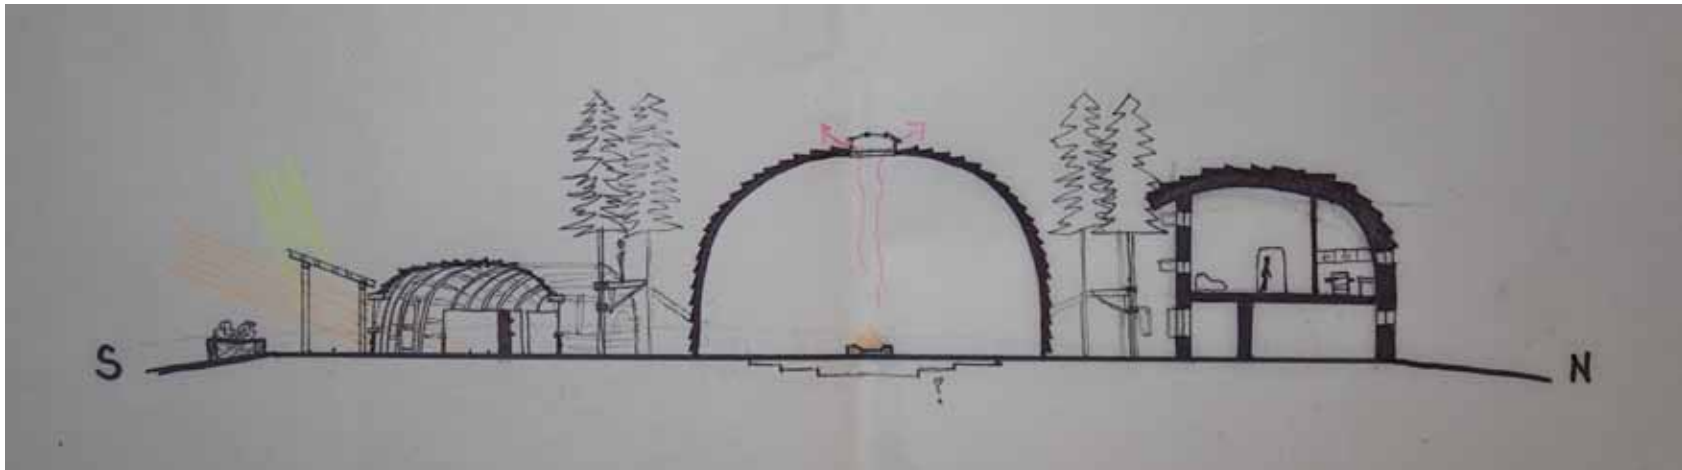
Section based on sixth iteration with new roof structure on second-storey and gathering space oculus opening to outdoors
